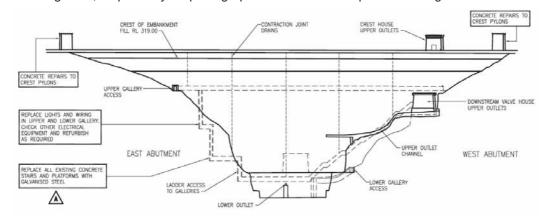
Elevation of the Avon Dam Wall (Source: WaterNSW, 2015a)
